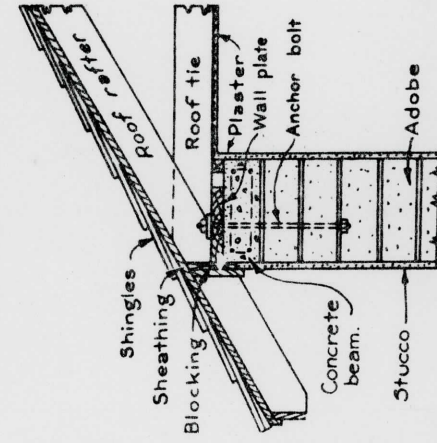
Anchoring a sloped roof to an earth-block wall.
